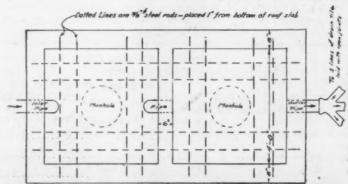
PLAN SHOWING PROPER POSITION OF REINFORCING RODS.
